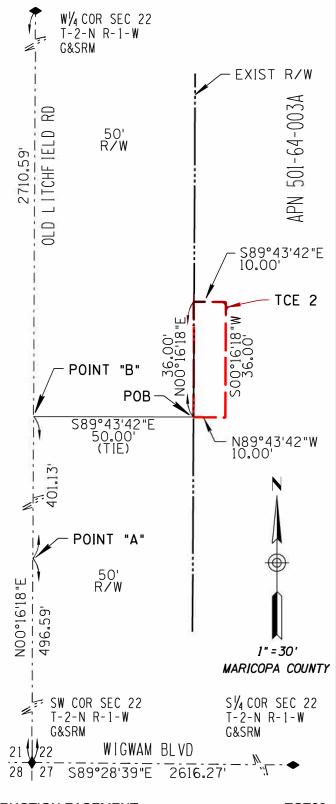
EXHIBIT: TEMPORARY CONSTRUCTION EASEMENT
